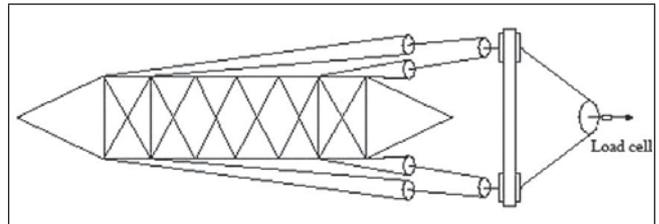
(C) WIND LOAD APPLICATION AT BRIDGE
